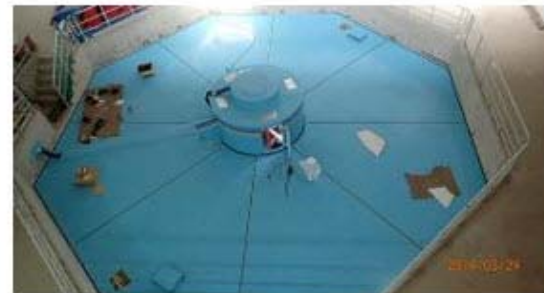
Assembly of generator air housing (Unit 2)
